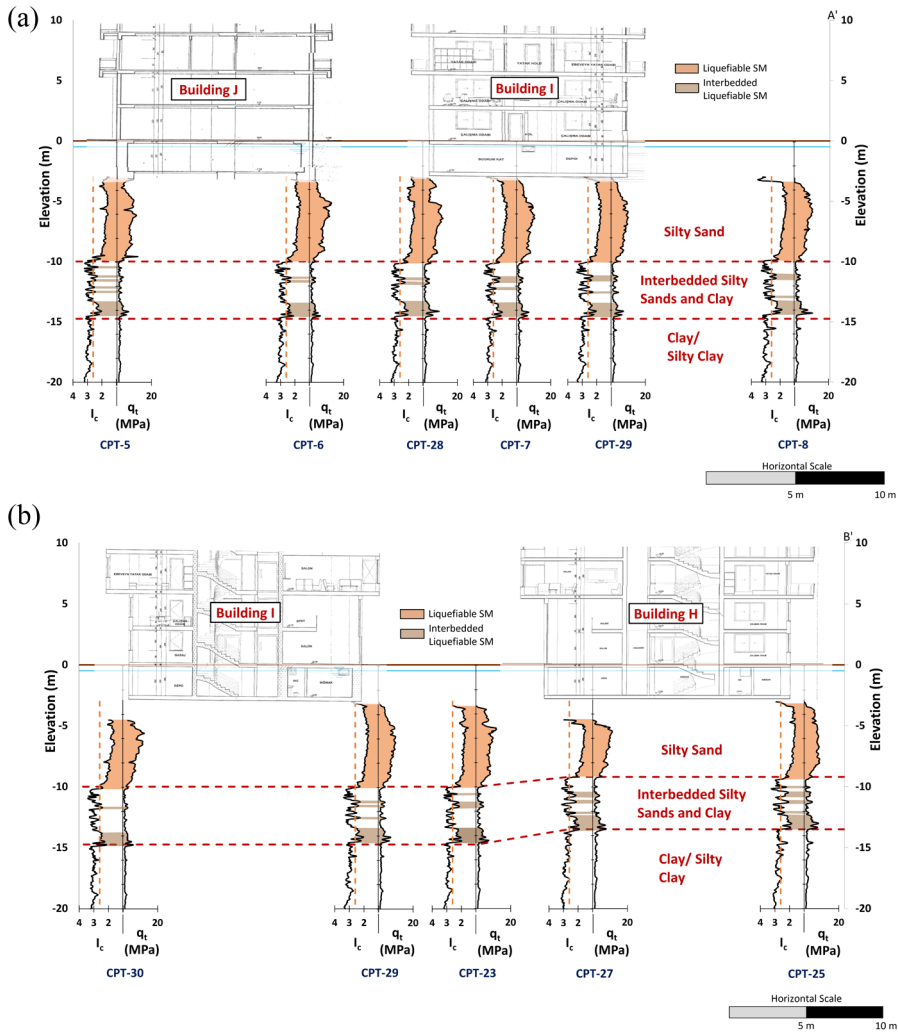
Cross-sections (a) A-A' across buildings J and I and (b) B-B' Buildings I and H (only first 3 stories of building plans shown) from Figure 9.
